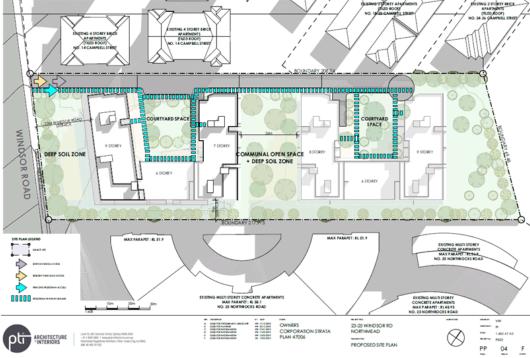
Site Reference Plan, 23-25 Windsor Road Northmead (Source: PTI Architecture)
